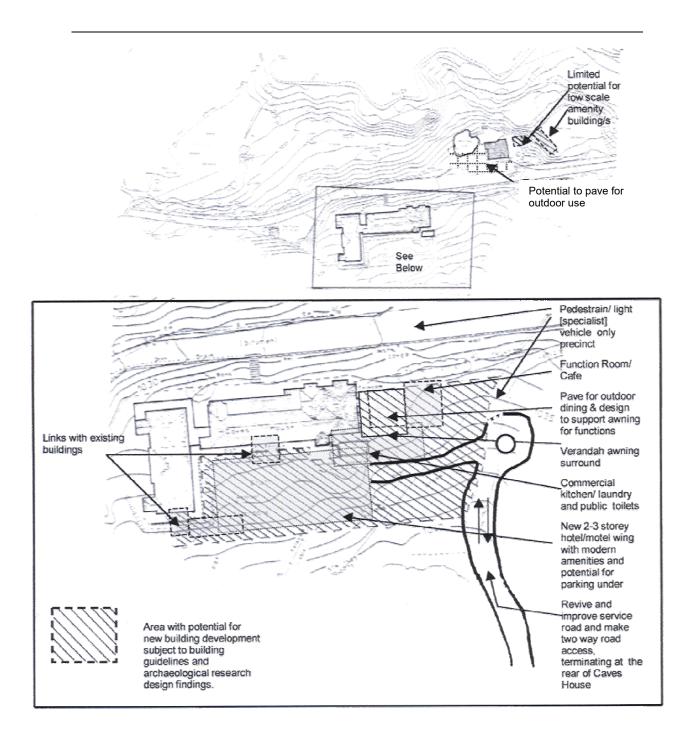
New building opportunities associated with the Caves House site and a new building layout concept.
